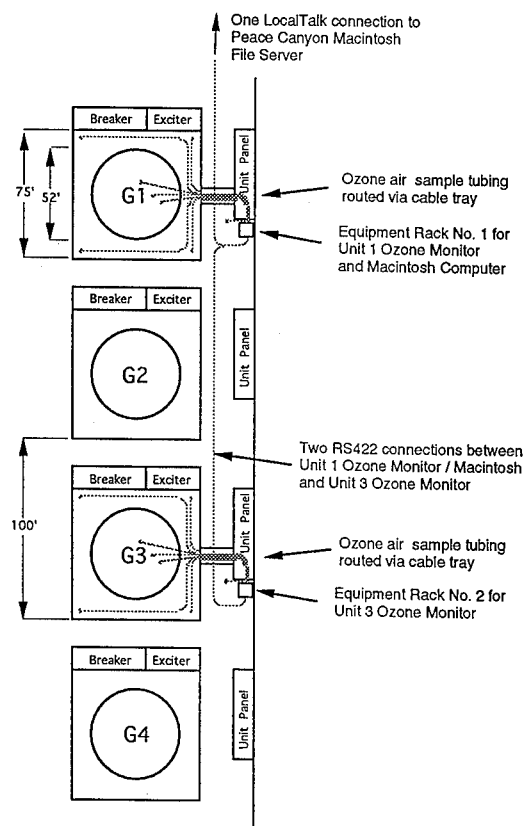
Plan view of Peace Canyon Plant Layout for installation of Tubing and Instrument Racks
